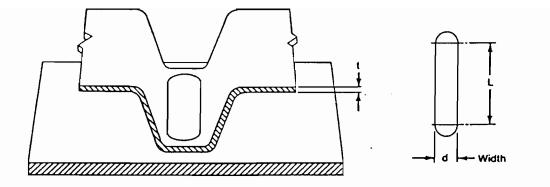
A Arc Seam Welds - Sheet to Supporting Member in Flat Position
